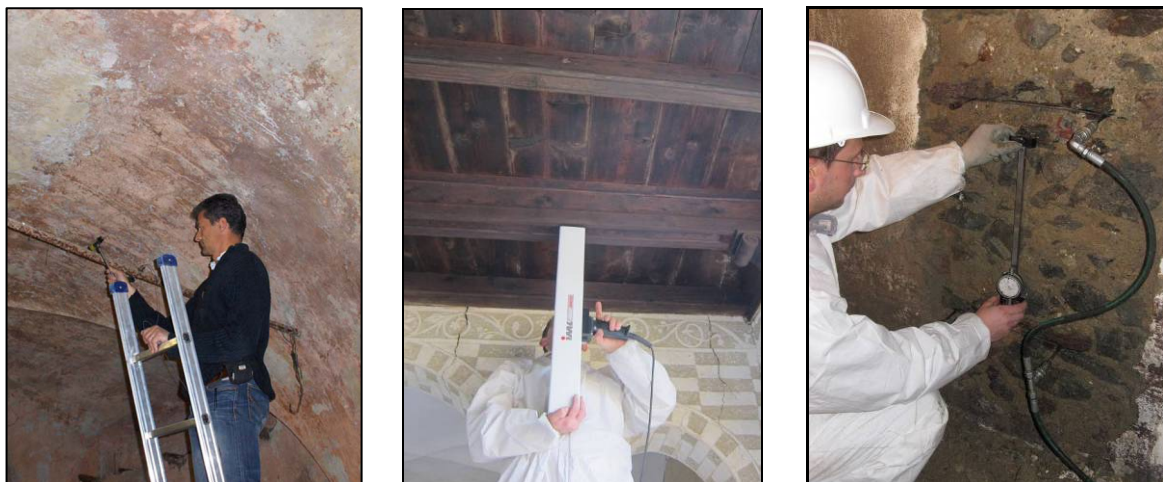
(B.P.) - Non-destructive testing and slightly destructive testing
